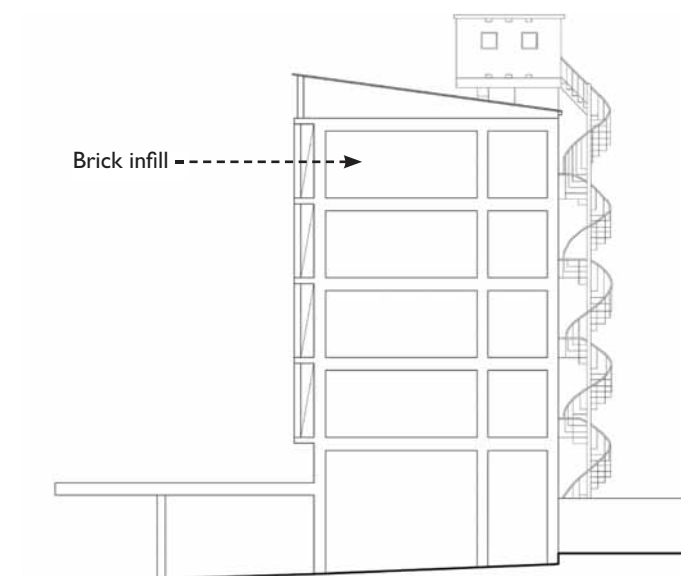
Northern elevation of the Berrals building. Brick infill between the column grid can be removed to allow for outward expansion on the northern and southern facades (Author, 2010).
